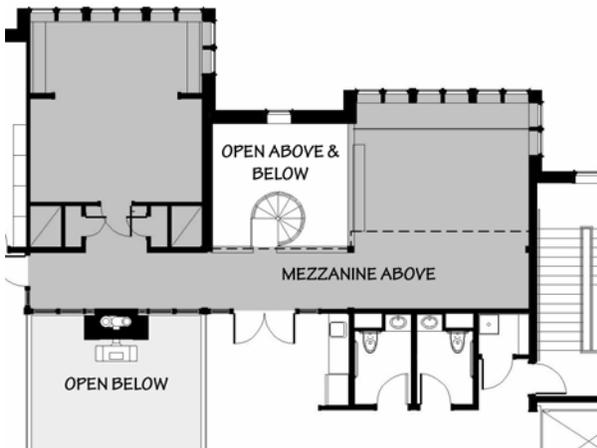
Partial UEC second floor plan (northeast corner). Office area is illustrated in grey.
